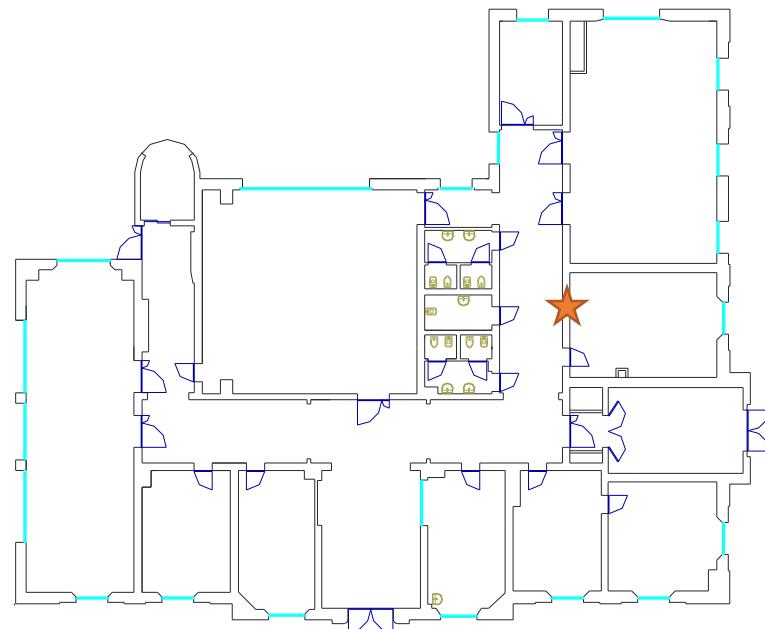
/b: The ground level plan with position of in situ investigation tests (L_PT_01).
